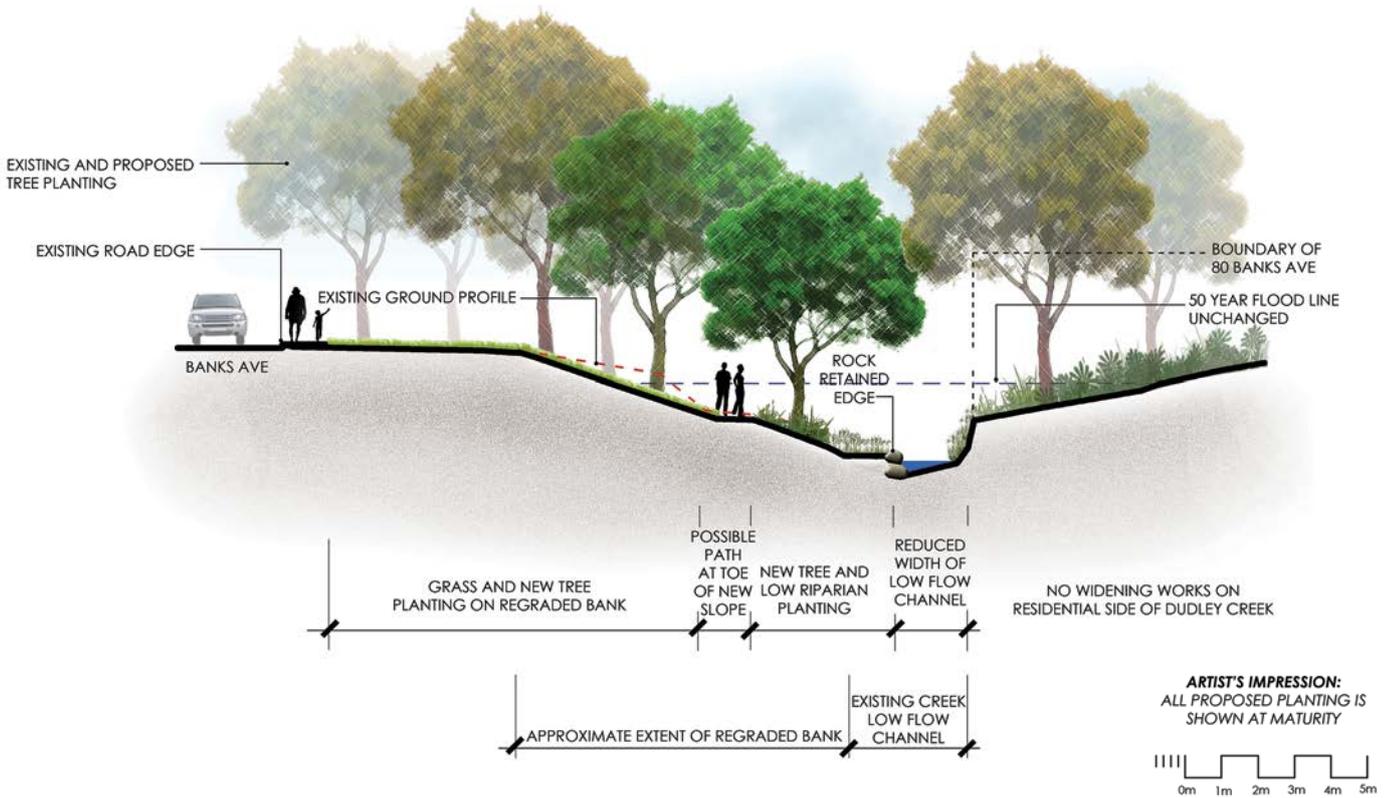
Downstream Option A – Cross Section F (looking downstream from Residential Red Zone)
